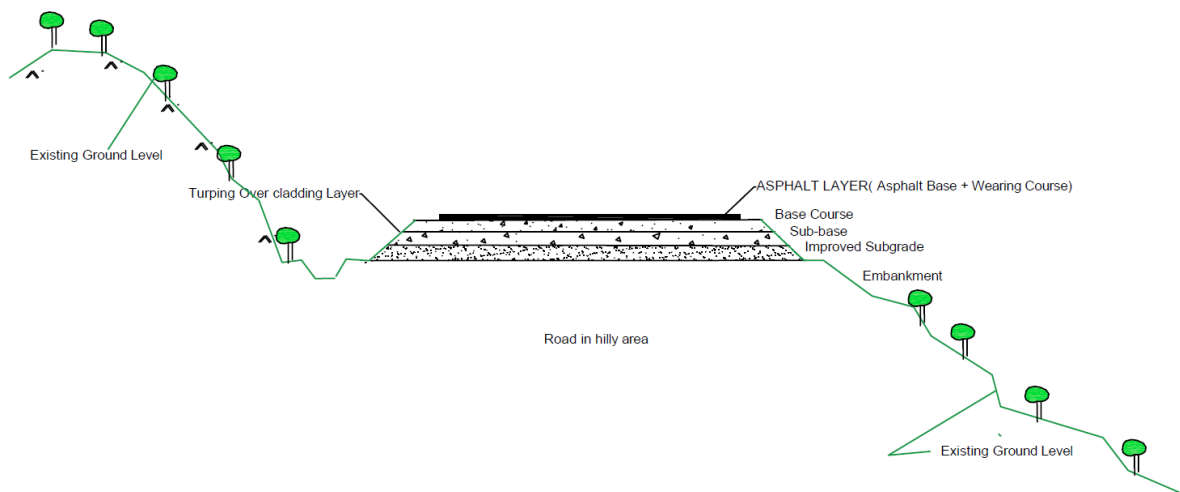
Alternative (cross sections) used to ensure sufficient cross sloping and drainage (van Steenbergen et al., 2021)
